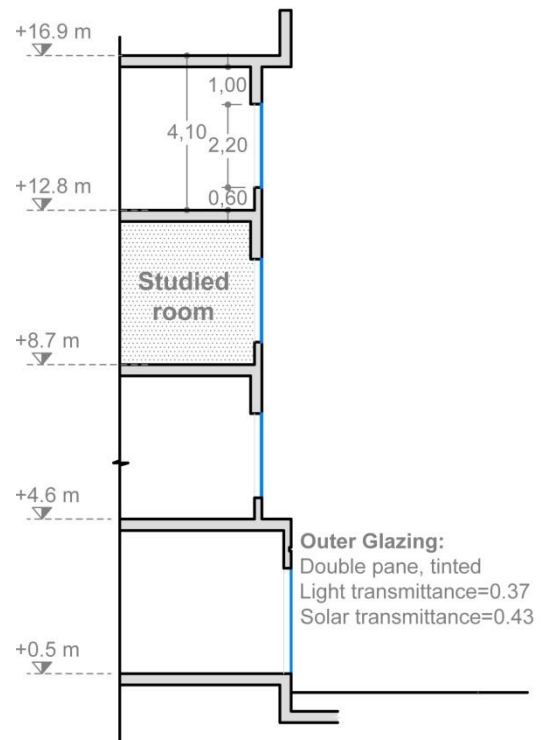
Schematic wall cross-section of the B-19 building. The studied room is on the second floor representing a typical mid-floor space. Source: author.
